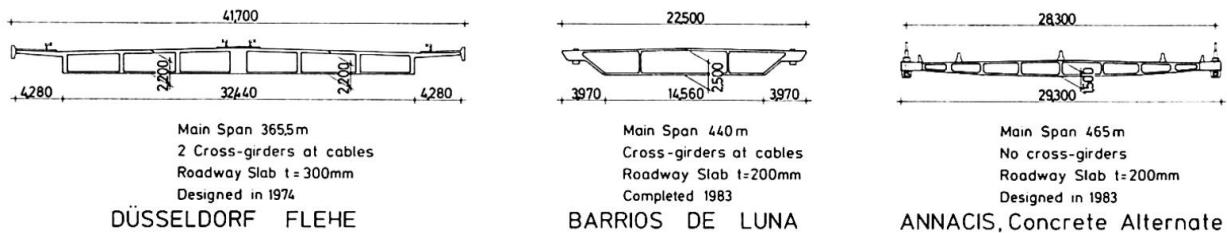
Cross-sections of long-span cable-stayed concrete bridge beams
